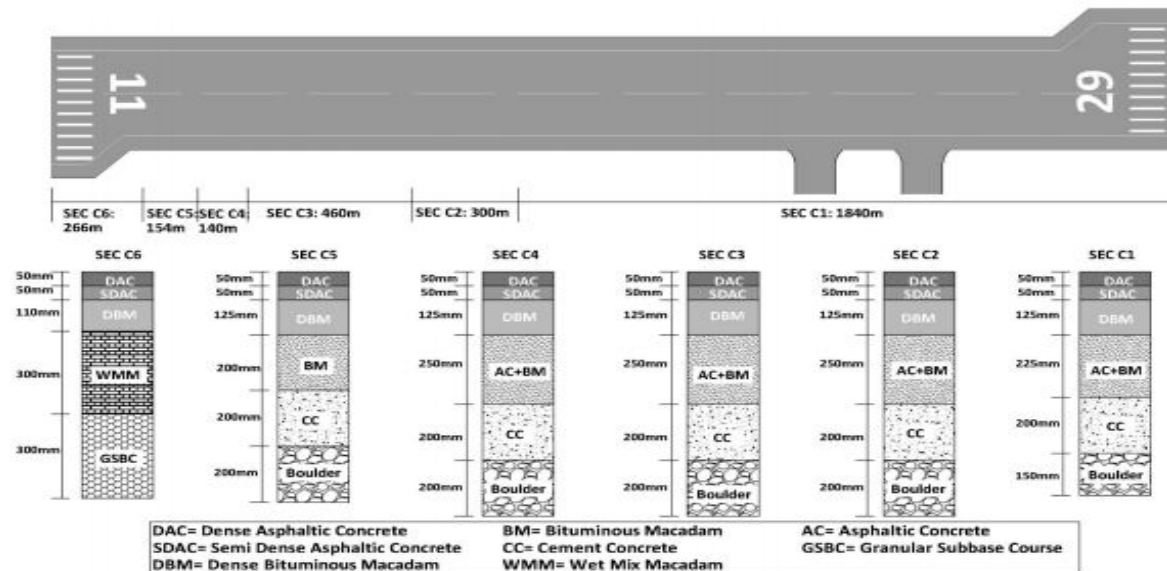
Existing Layers of OIA Runway Pavement at Different Sections
